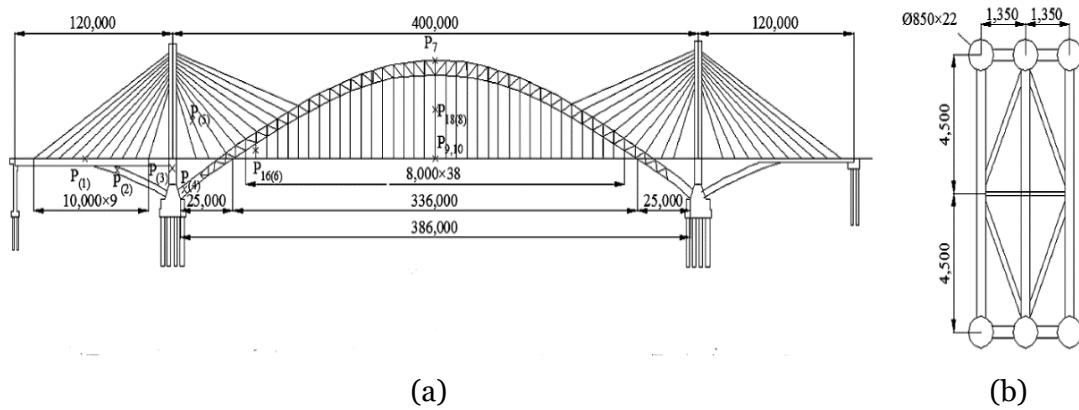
Liancheng Bridge a) Elevation view b) Rib cross section (adapted from [16]) (units in mm)
